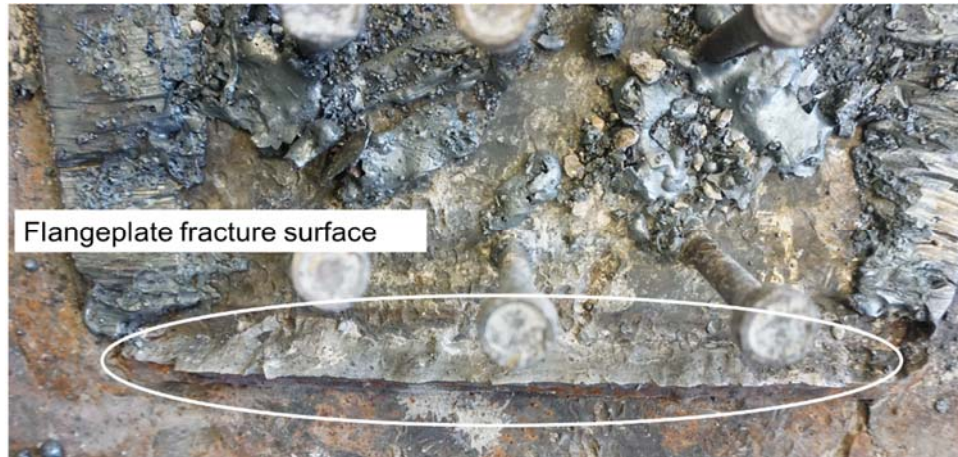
SC-W-H: Top view of baseplate (specimen removed)
